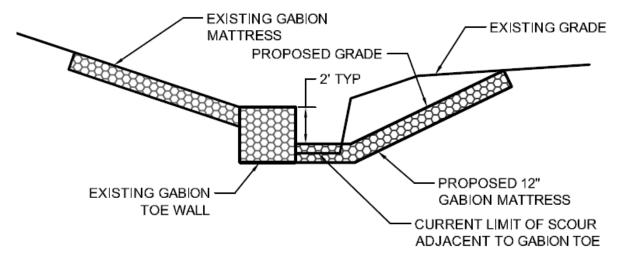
Concept Cross Section of Proposed Channel Armoring between Stations 26+65 and 25+50
